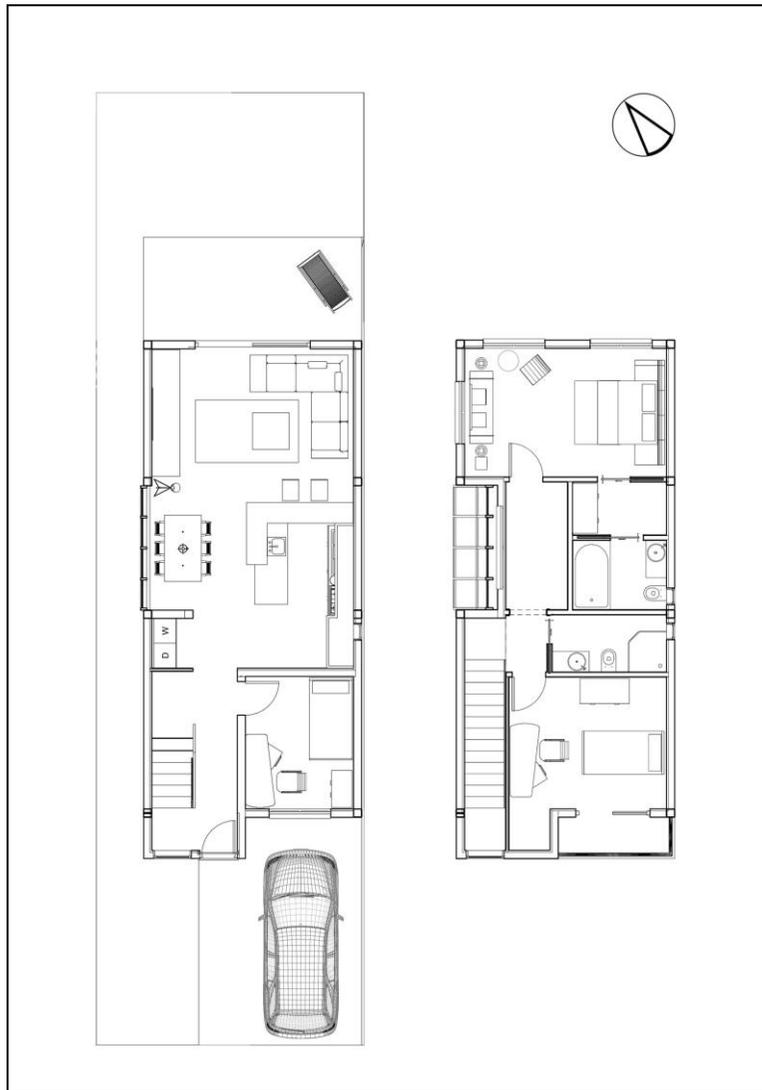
Ground floor furnished plan (left), first floor furnished plan (right)
